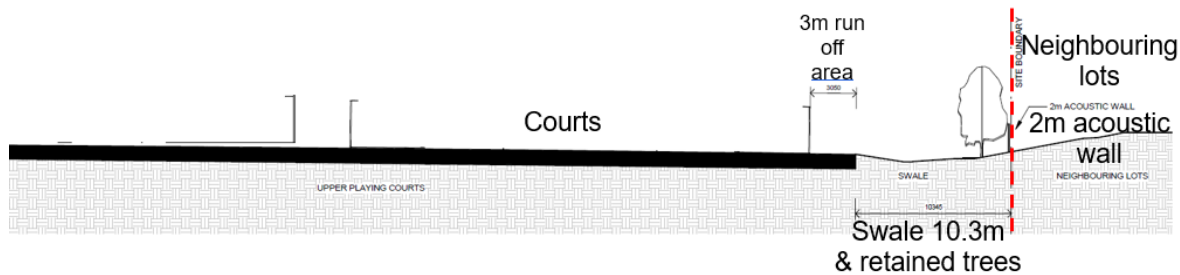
Extract from Site Section Plan DA-40-04 showing the upper courts (left), swale and existing trees, and neighbouring residences to the south (18 & 20 Winbourne Street) (right).
